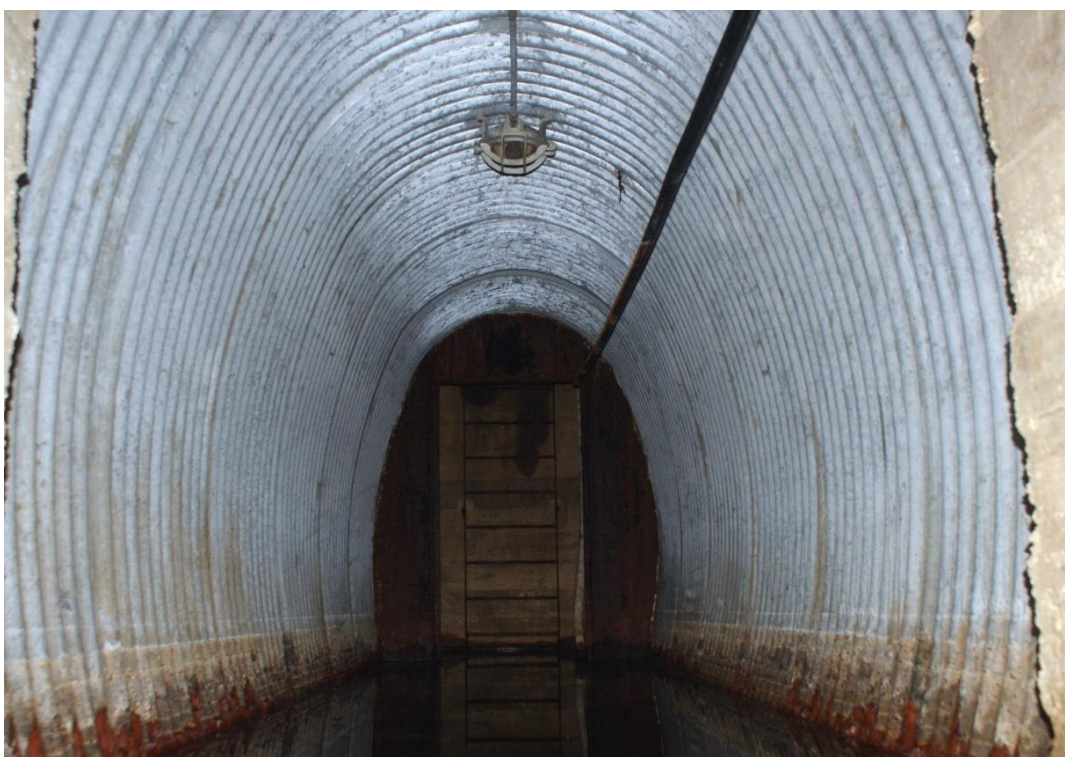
View looking from the basement refuge along the escape tunnel (photo: PF)
